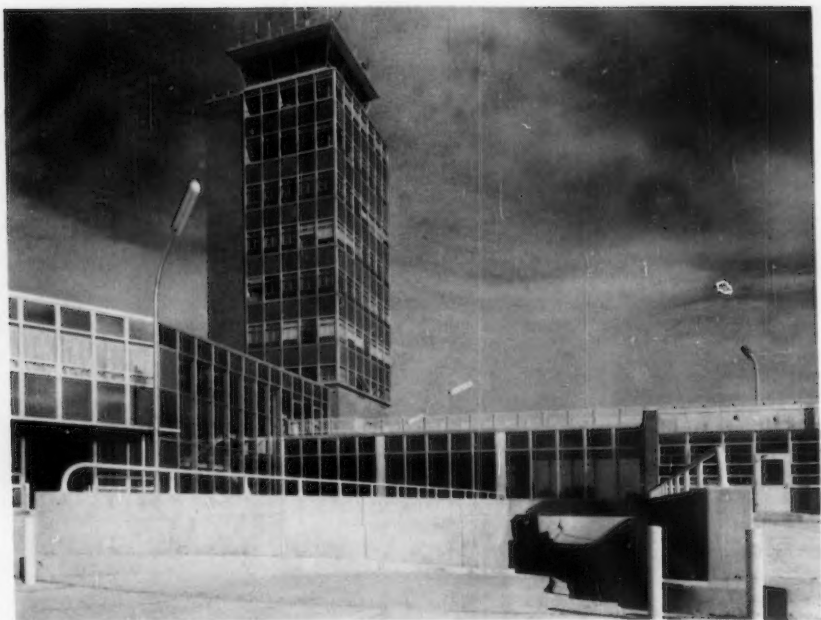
RAMP UNDERPASS-LOOKING NORTH TOWARDS PIER
